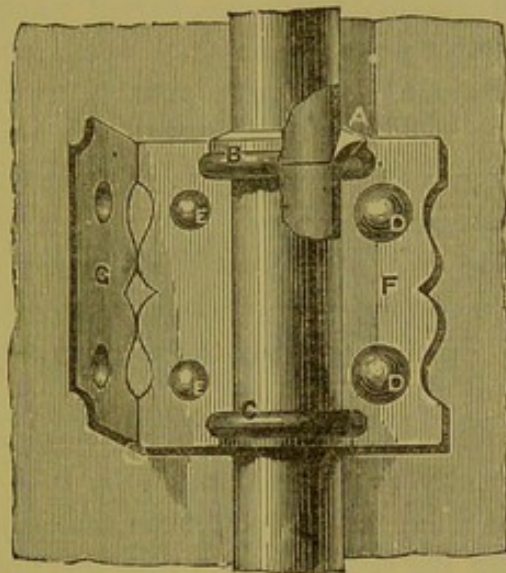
View of a soldered joint, with Astragals and Tacks.
